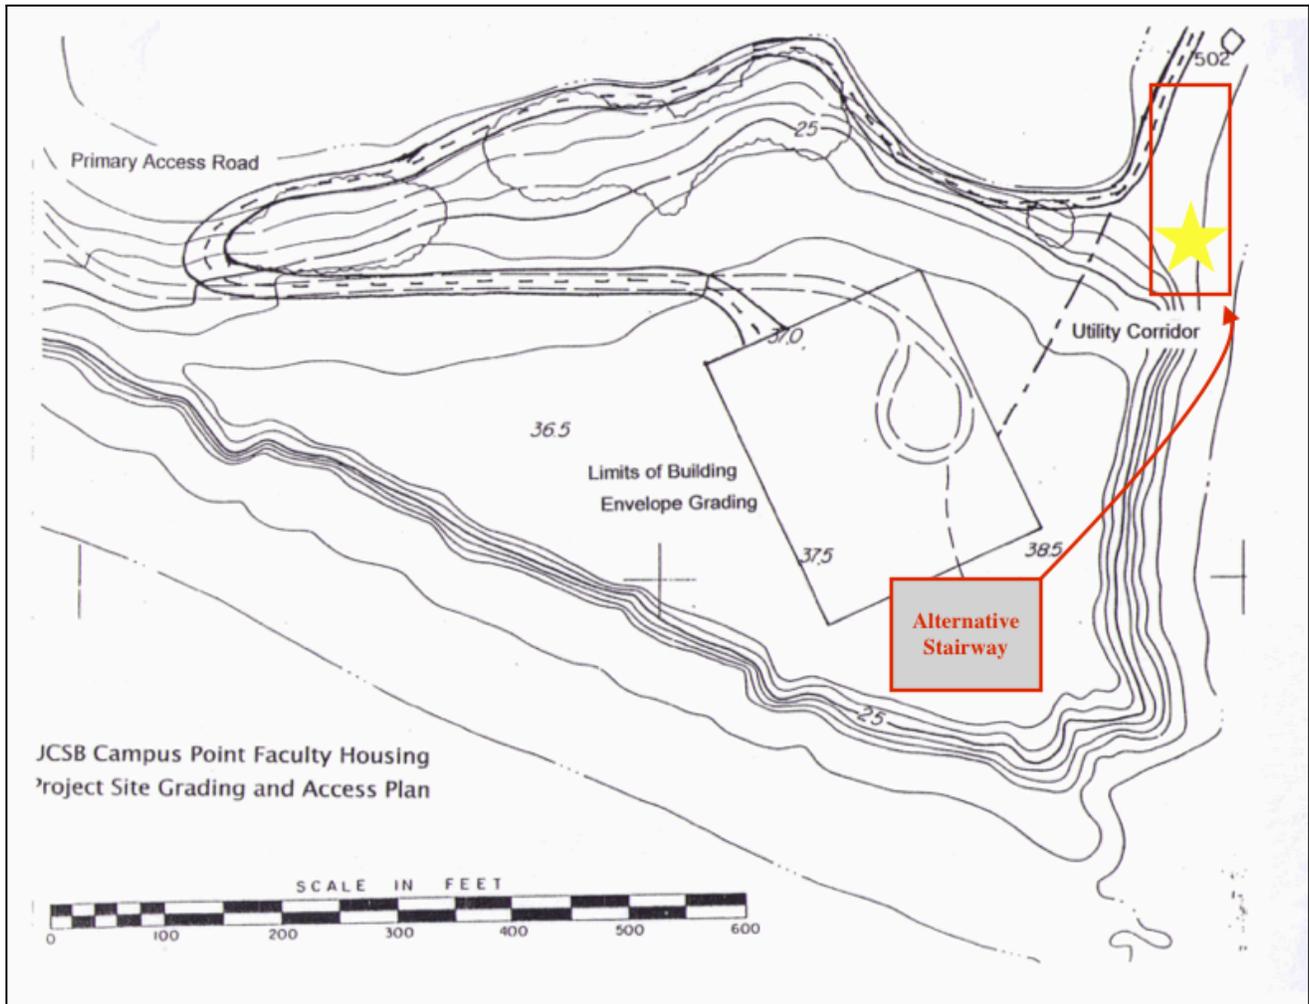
Alternative Stairway for Beach Access within Project Site
